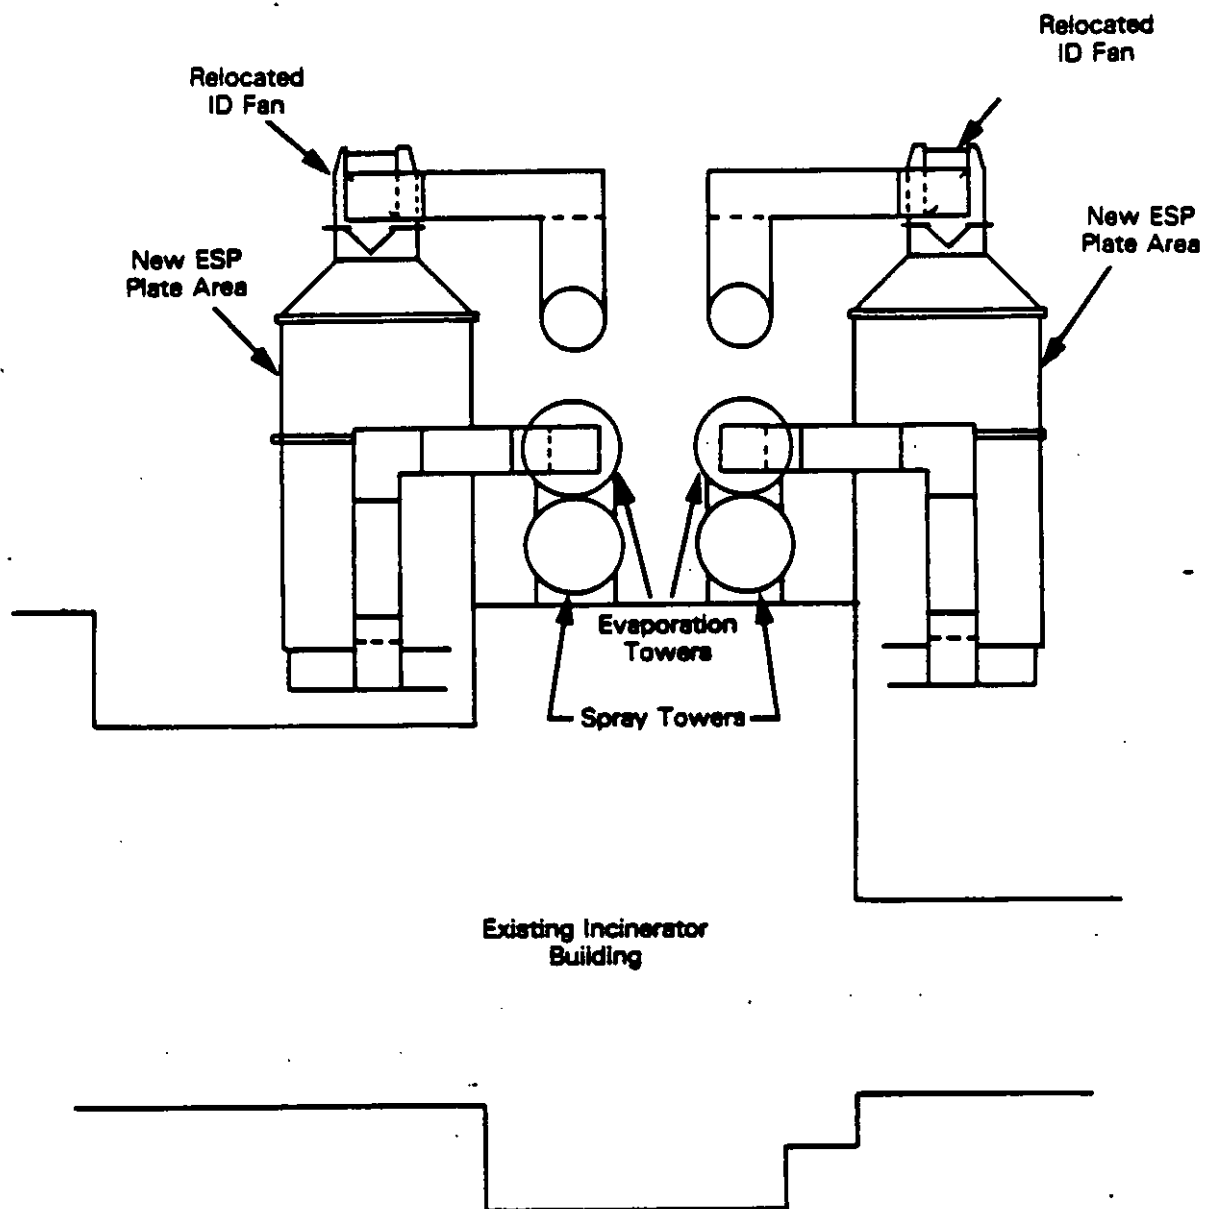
Plot Plan of New ESP Plate Area Equipment Arrangement
